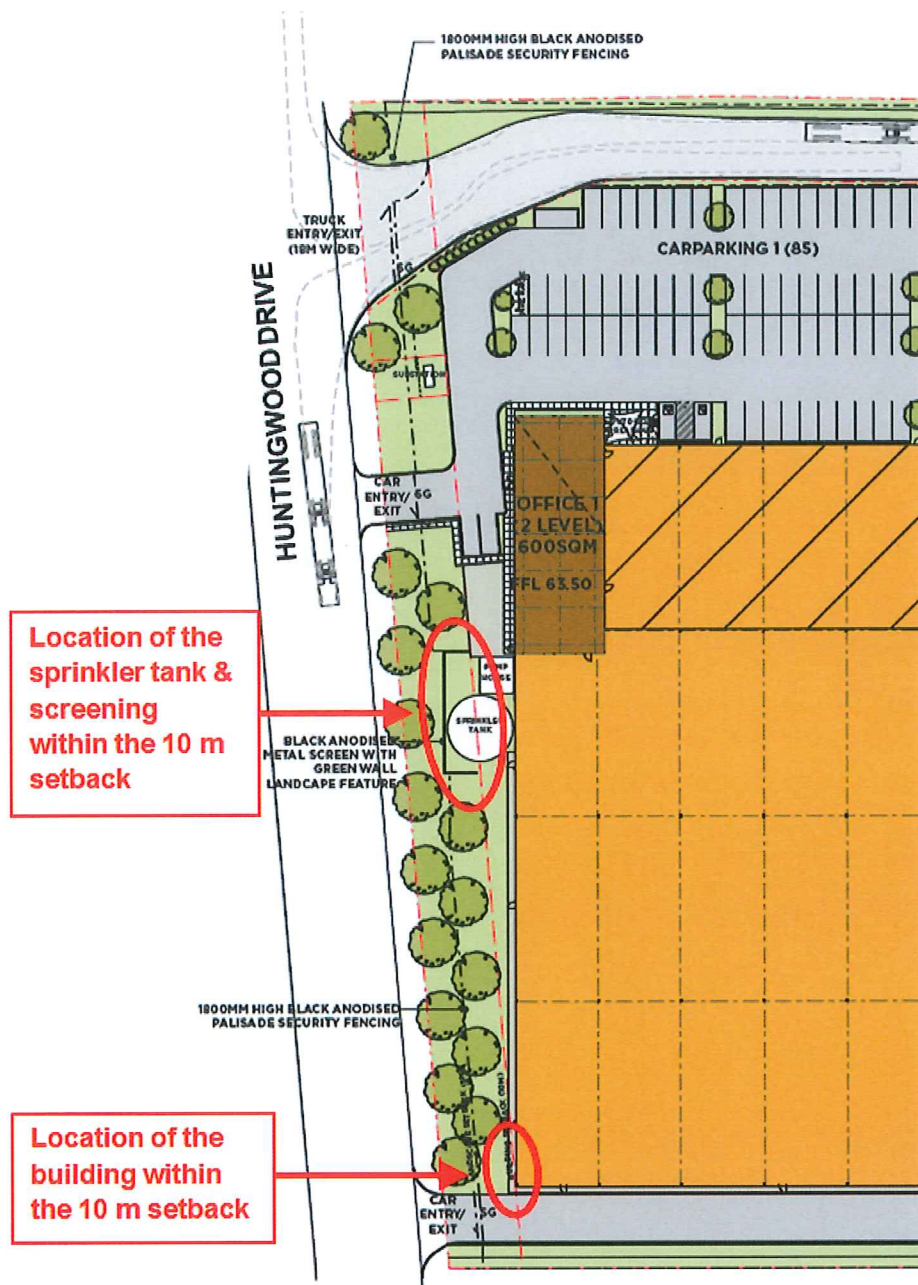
Marked up extract of the Building 1 Site Plan (Plan reference AA04) identifying the location of the encroachments into the 10 m street setback
